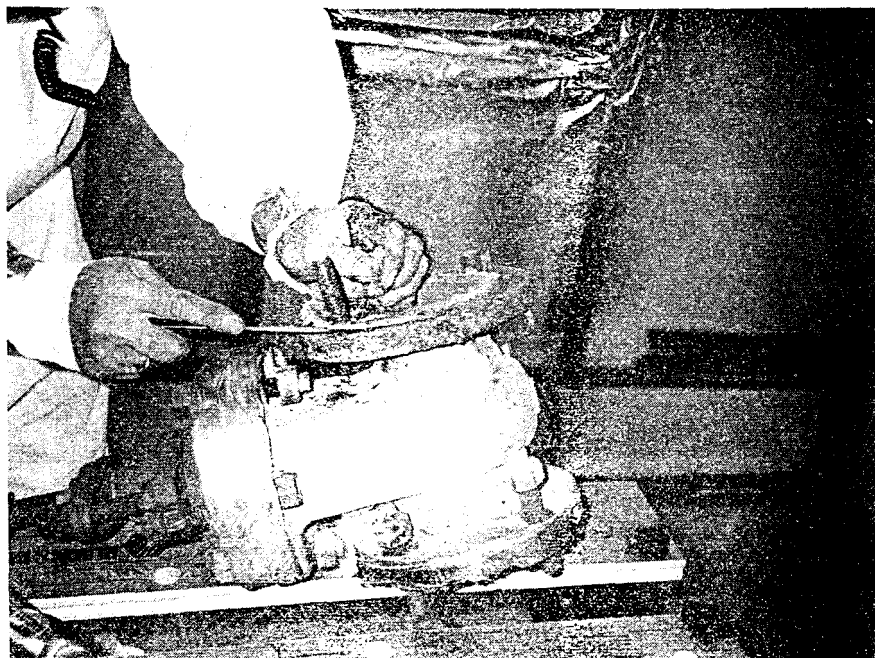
Removing an after service asbestos-containing gasket from a pipe flange by hand-scraping.
